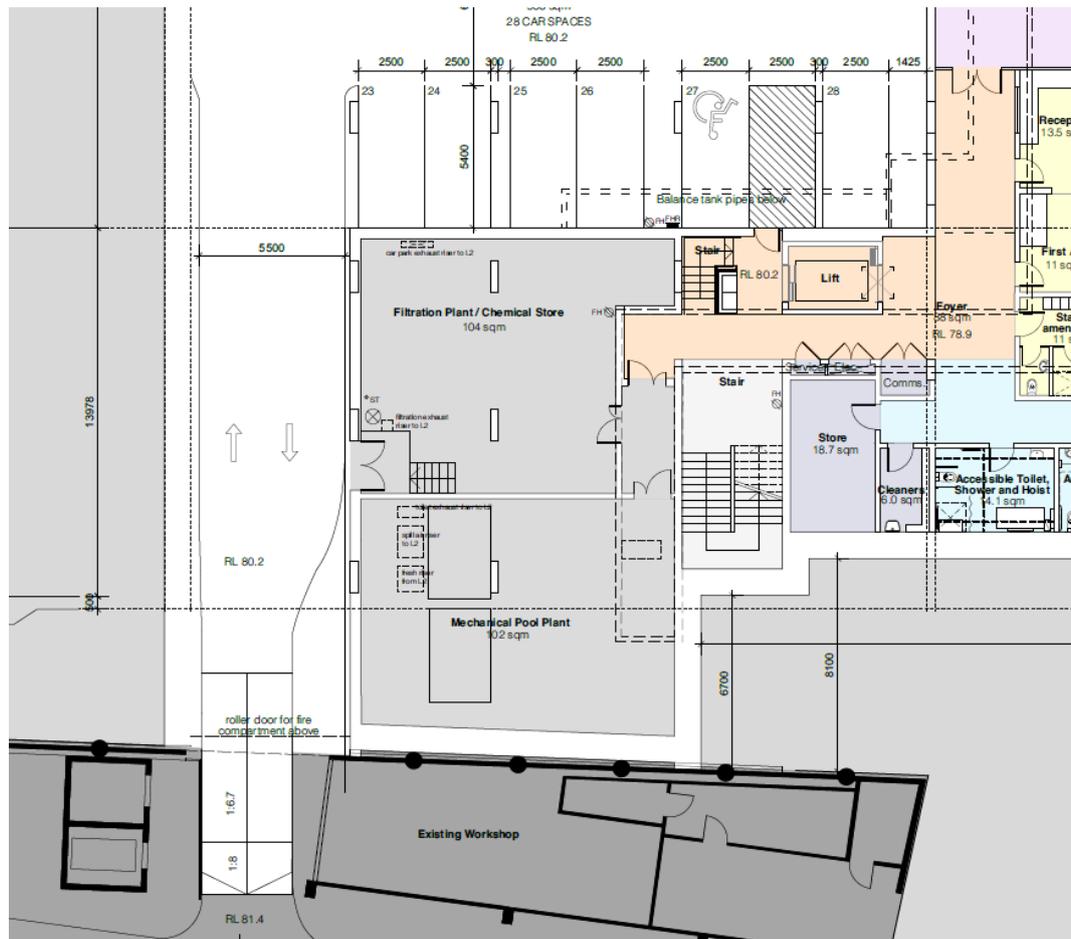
Connection shown on Level 1 between existing and proposed car parks
